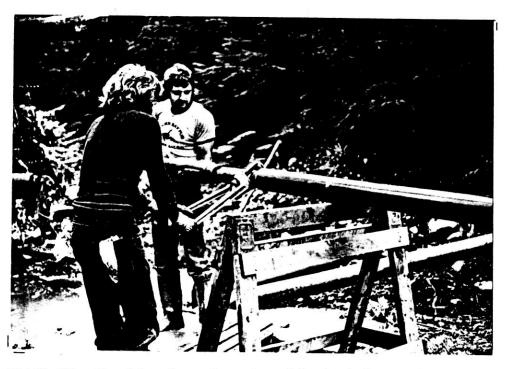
PLATE IV: Breaking Down Core Assembly in Order to Remove Inner Barrel and Core.
